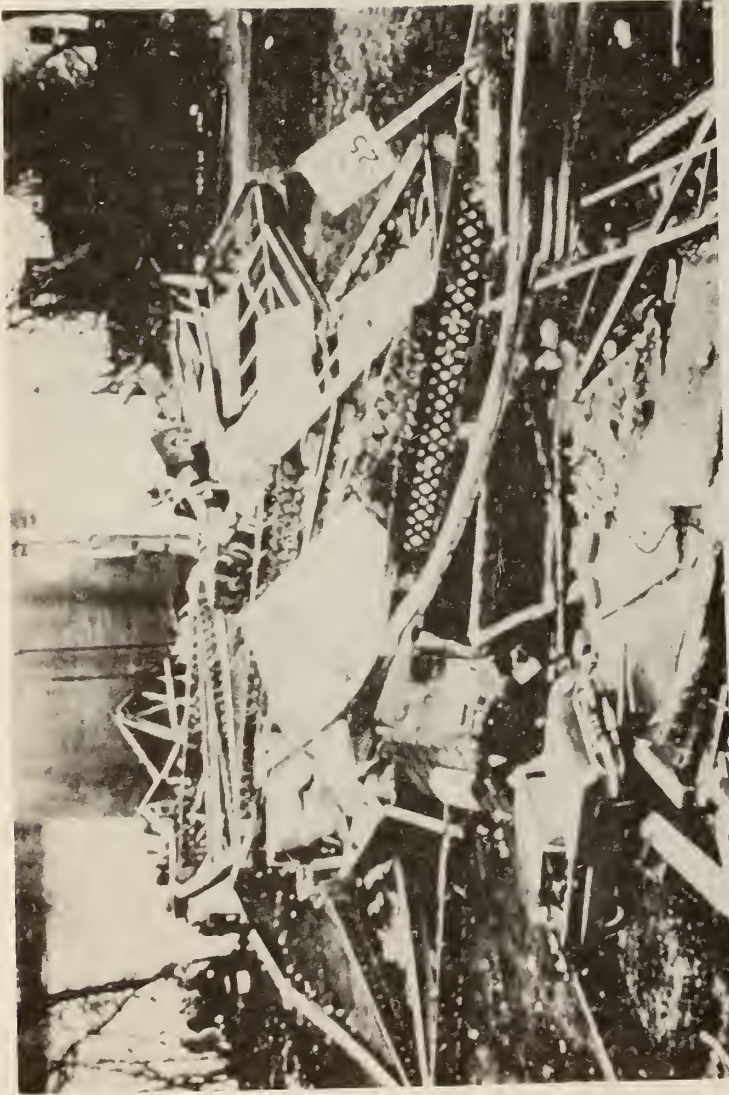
Photograph of Point Pleasant Bridge after collapse.
